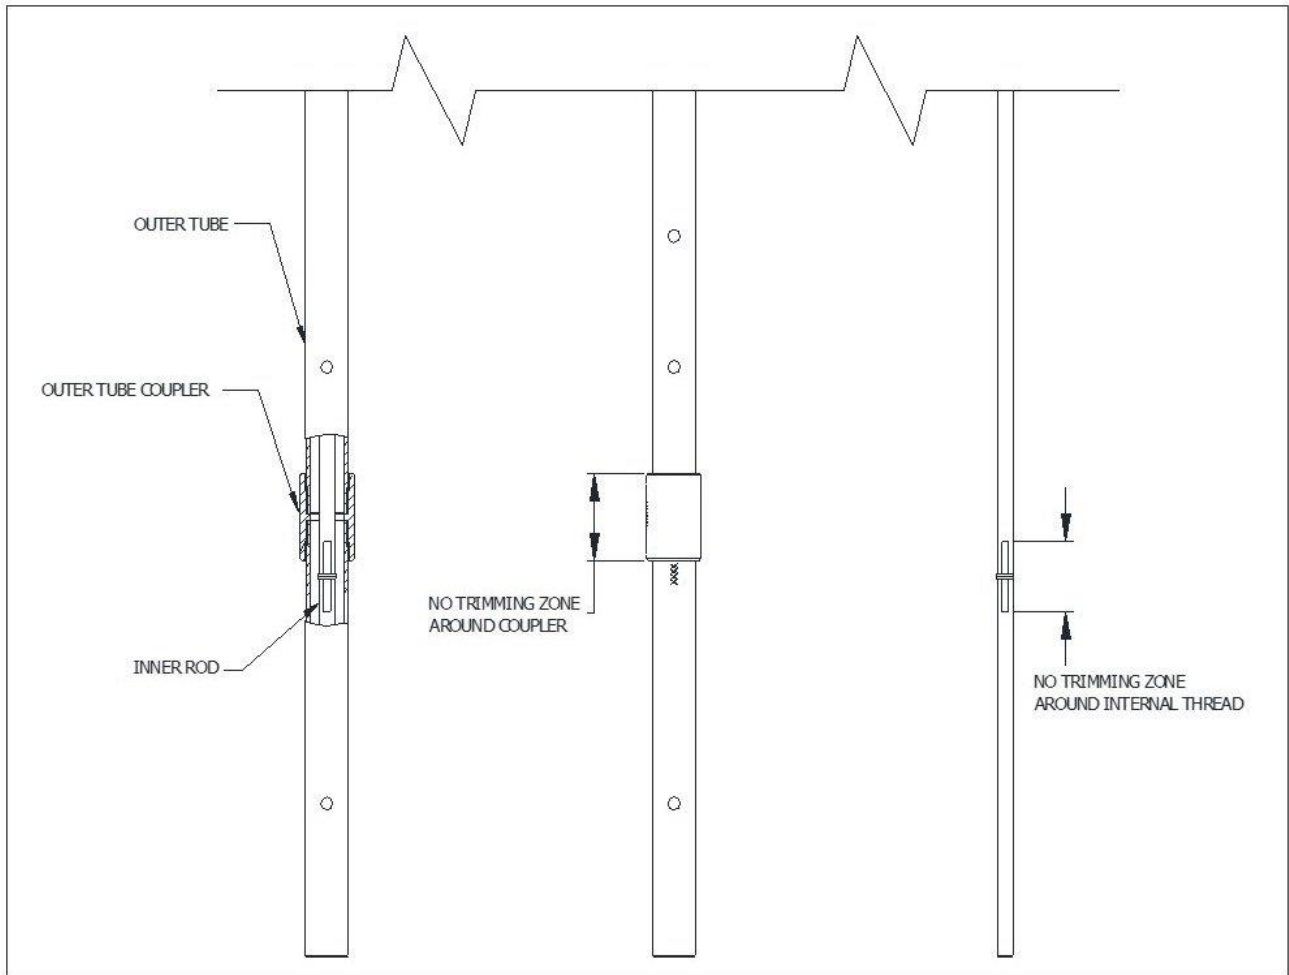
No Trimming Zones on Outer Tube and Inner Rod
